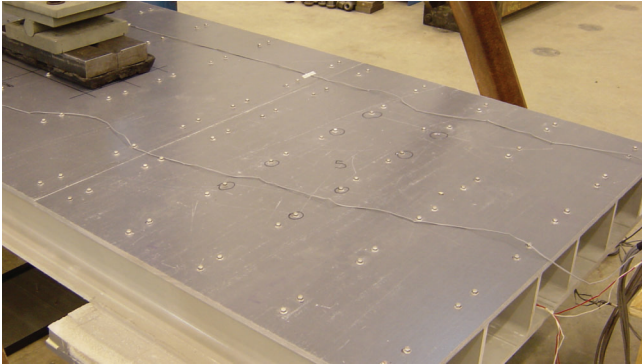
Epoxy-infused Screws Connecting Top Plate to Bottom Section
